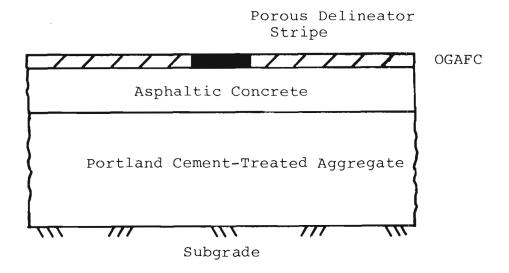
Cross-Section of Pavement at Pilot Test Section Site.
